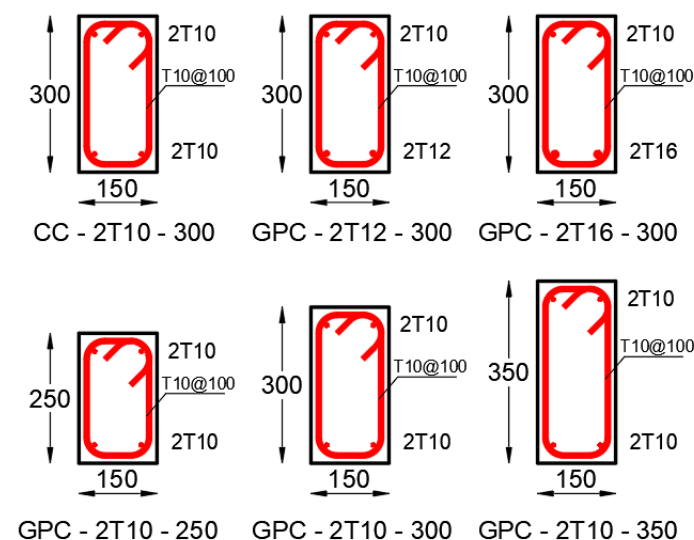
Geometries and reinforcement details of the beams (all dimensions in mm).
